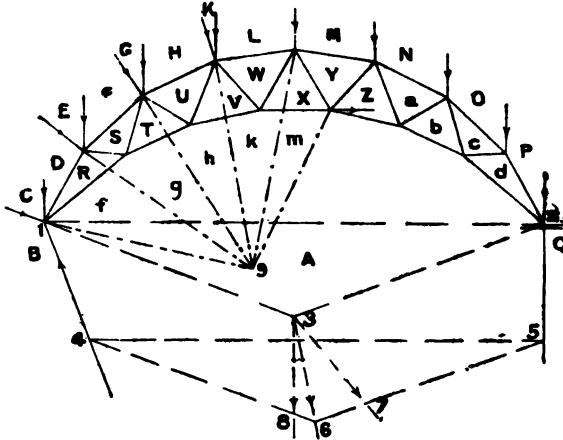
FRAME DIAGRAM. BOWSTRING TRUSS.
